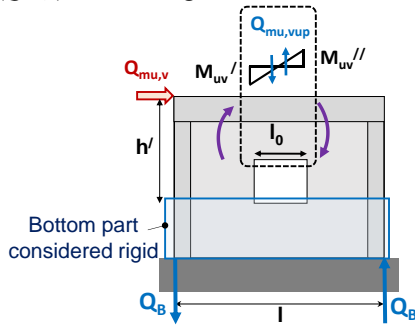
Flexural strength of wall with opening considering moment about vertical direction
